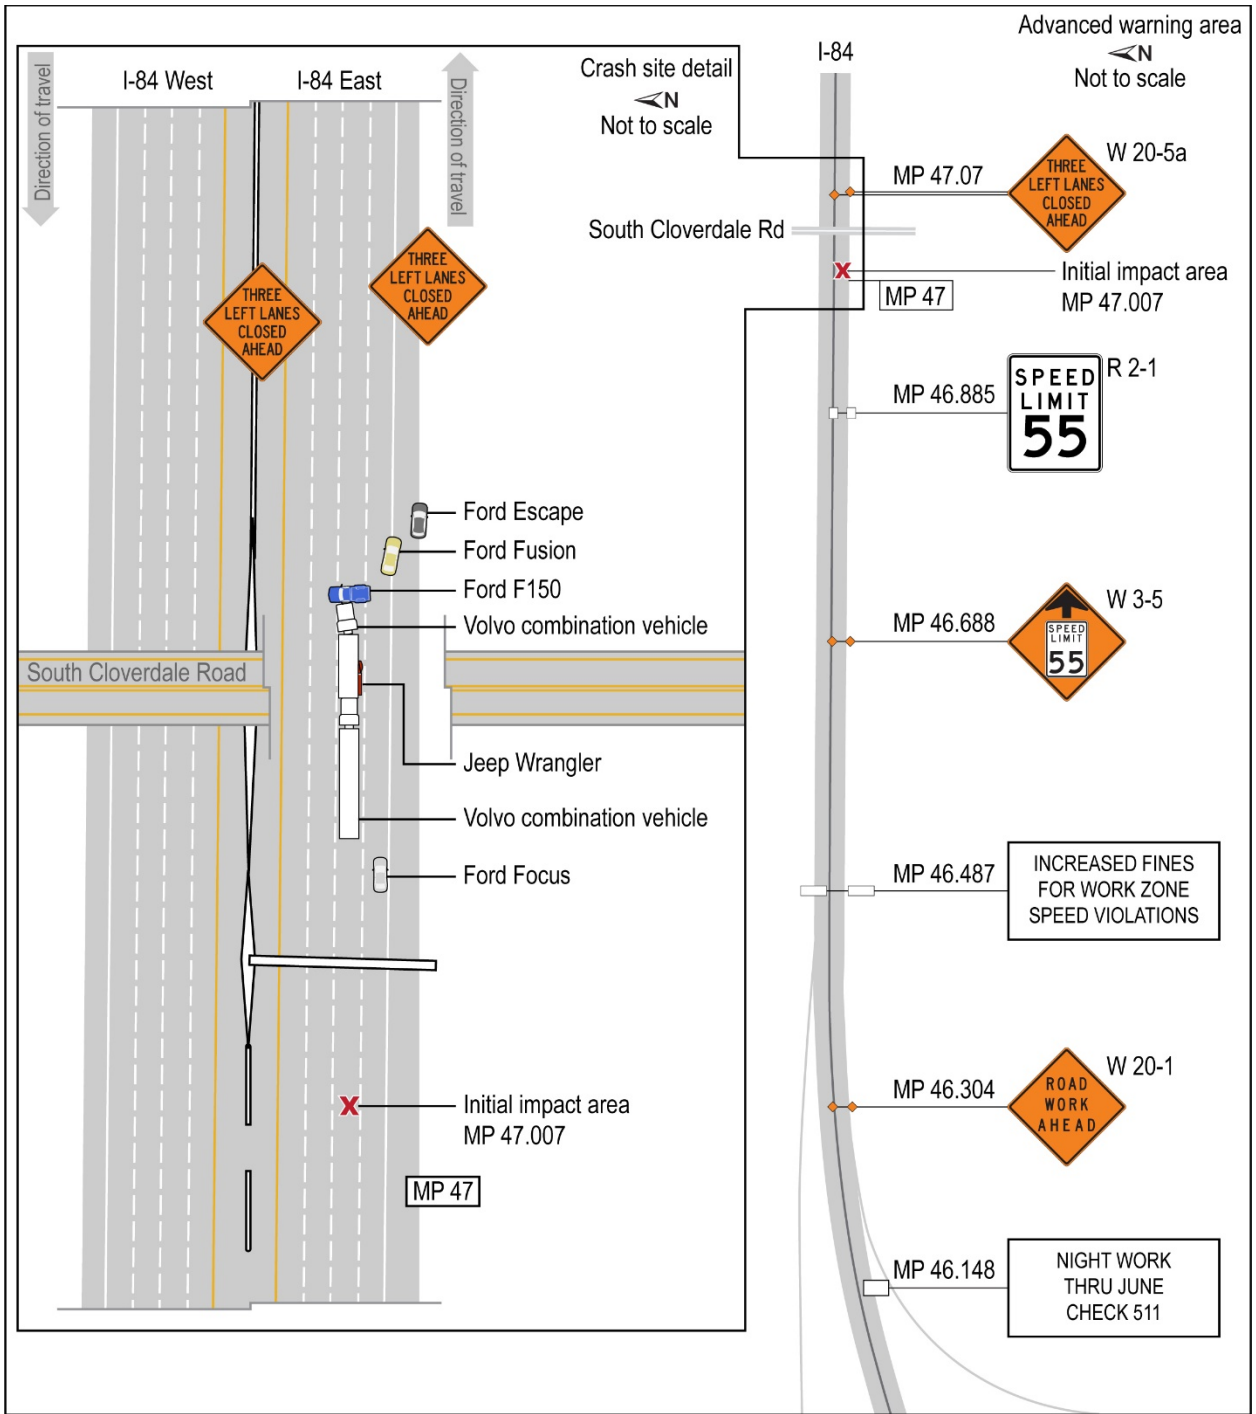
Advance Warning Area of Work Zone with Crash Site Detail
